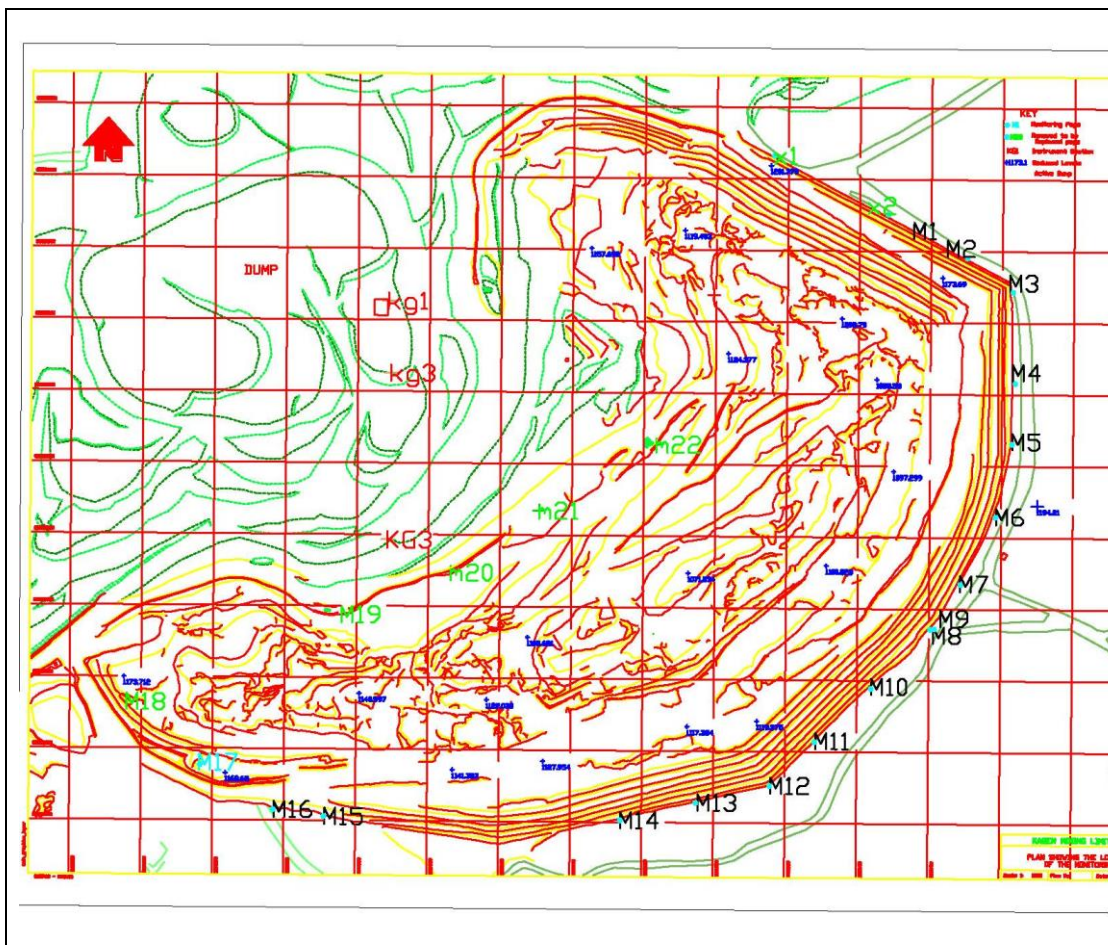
Kagem: Chama Pit Slope Monitoring Layout
